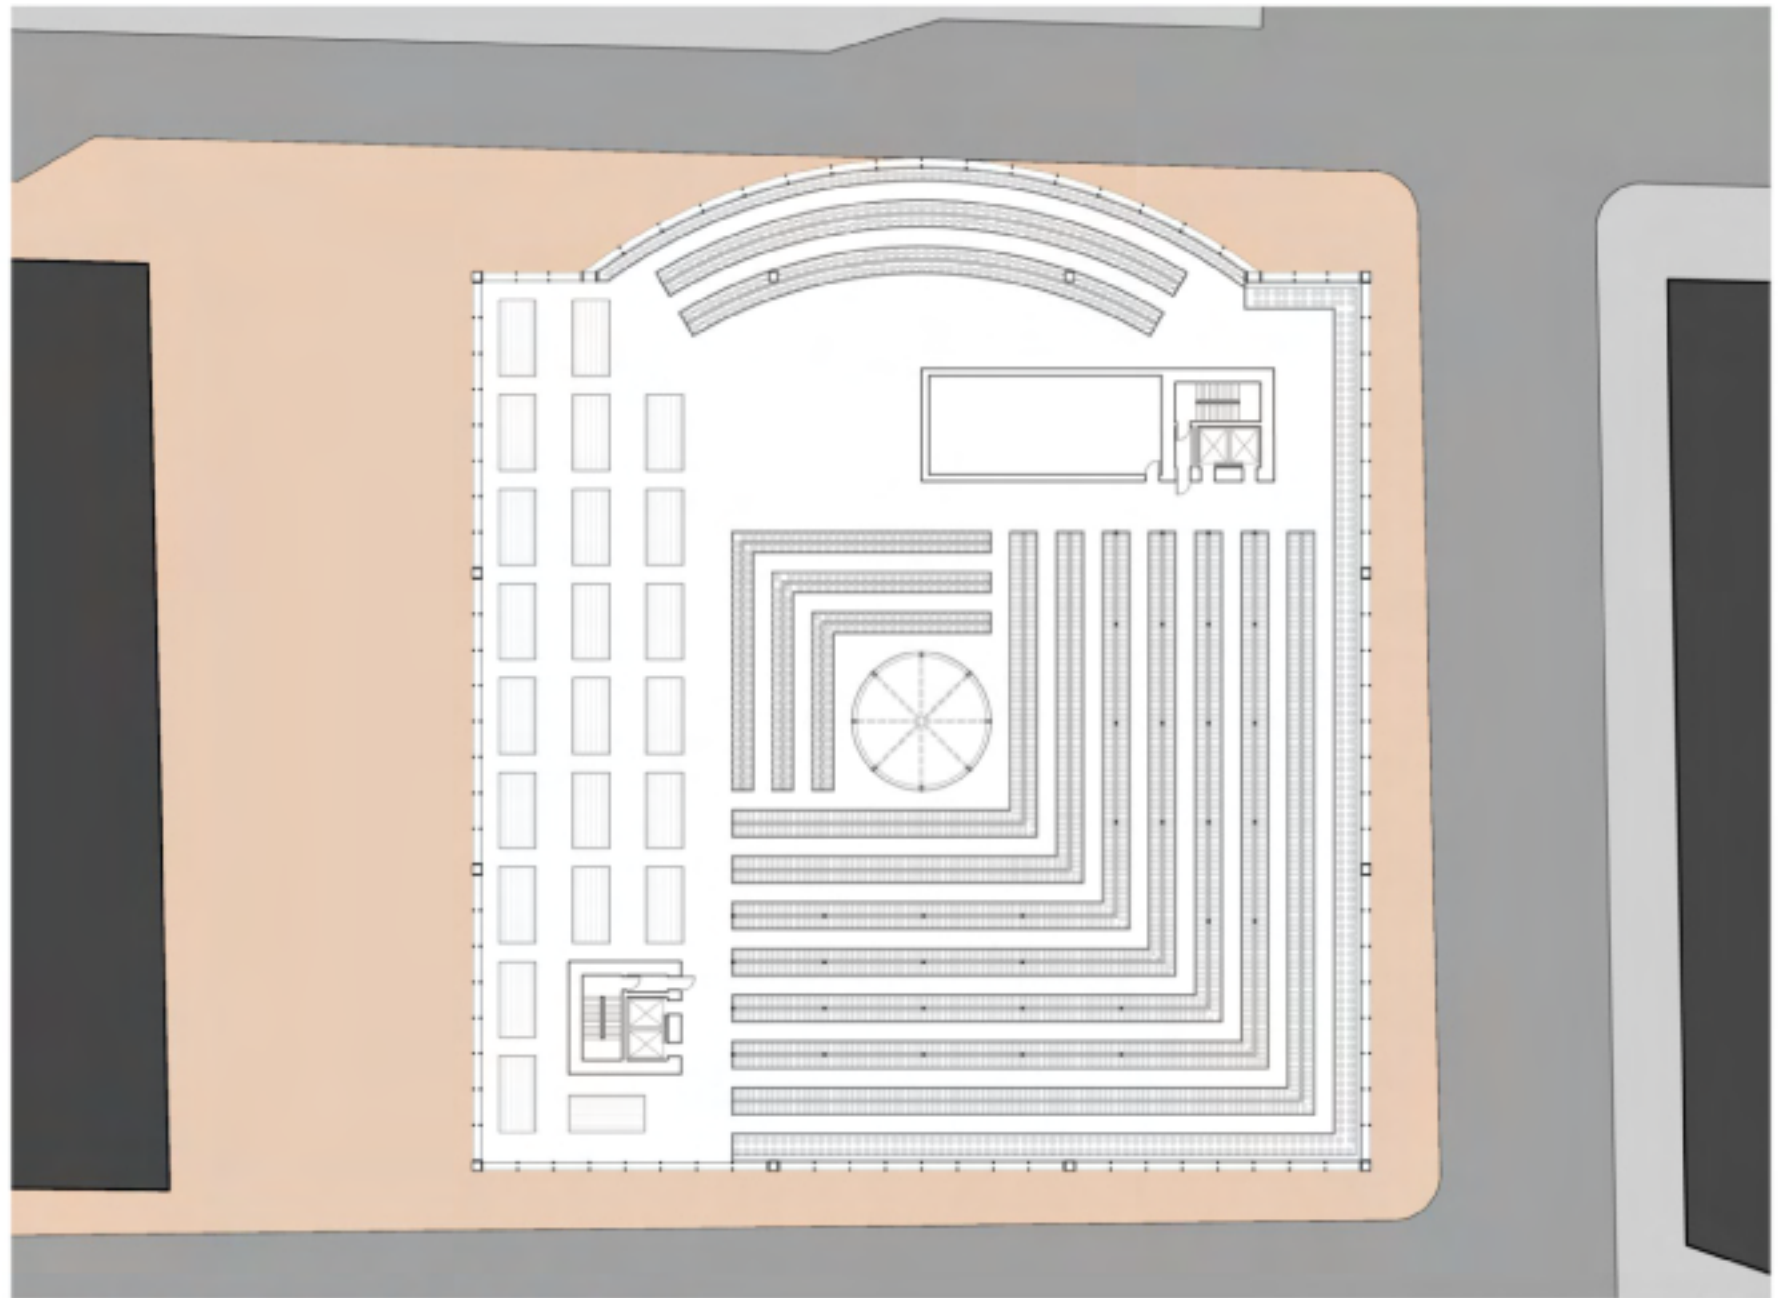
B: Fifth Floor Plan [Created using AutoCAD and Photoshop]
